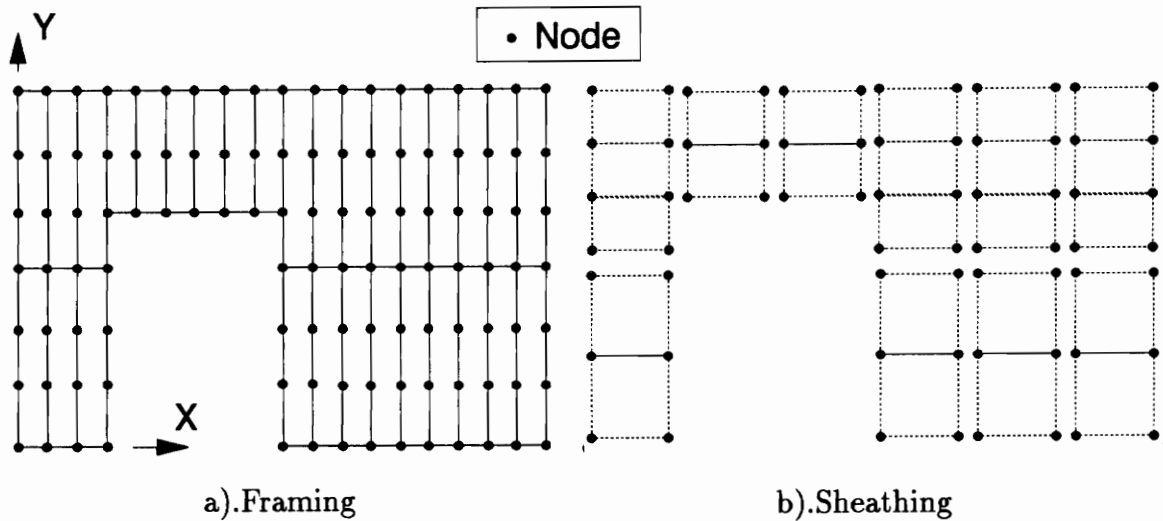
Configuration of 4.9 m (16 ft) High Shear Wall Model with 2.4 m (8 ft) Long Door Opening
